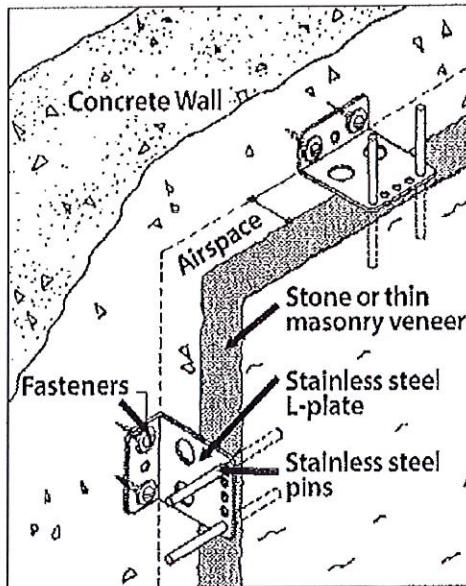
Rap-Tie System Application for Dimension Cut Stone Veneer
